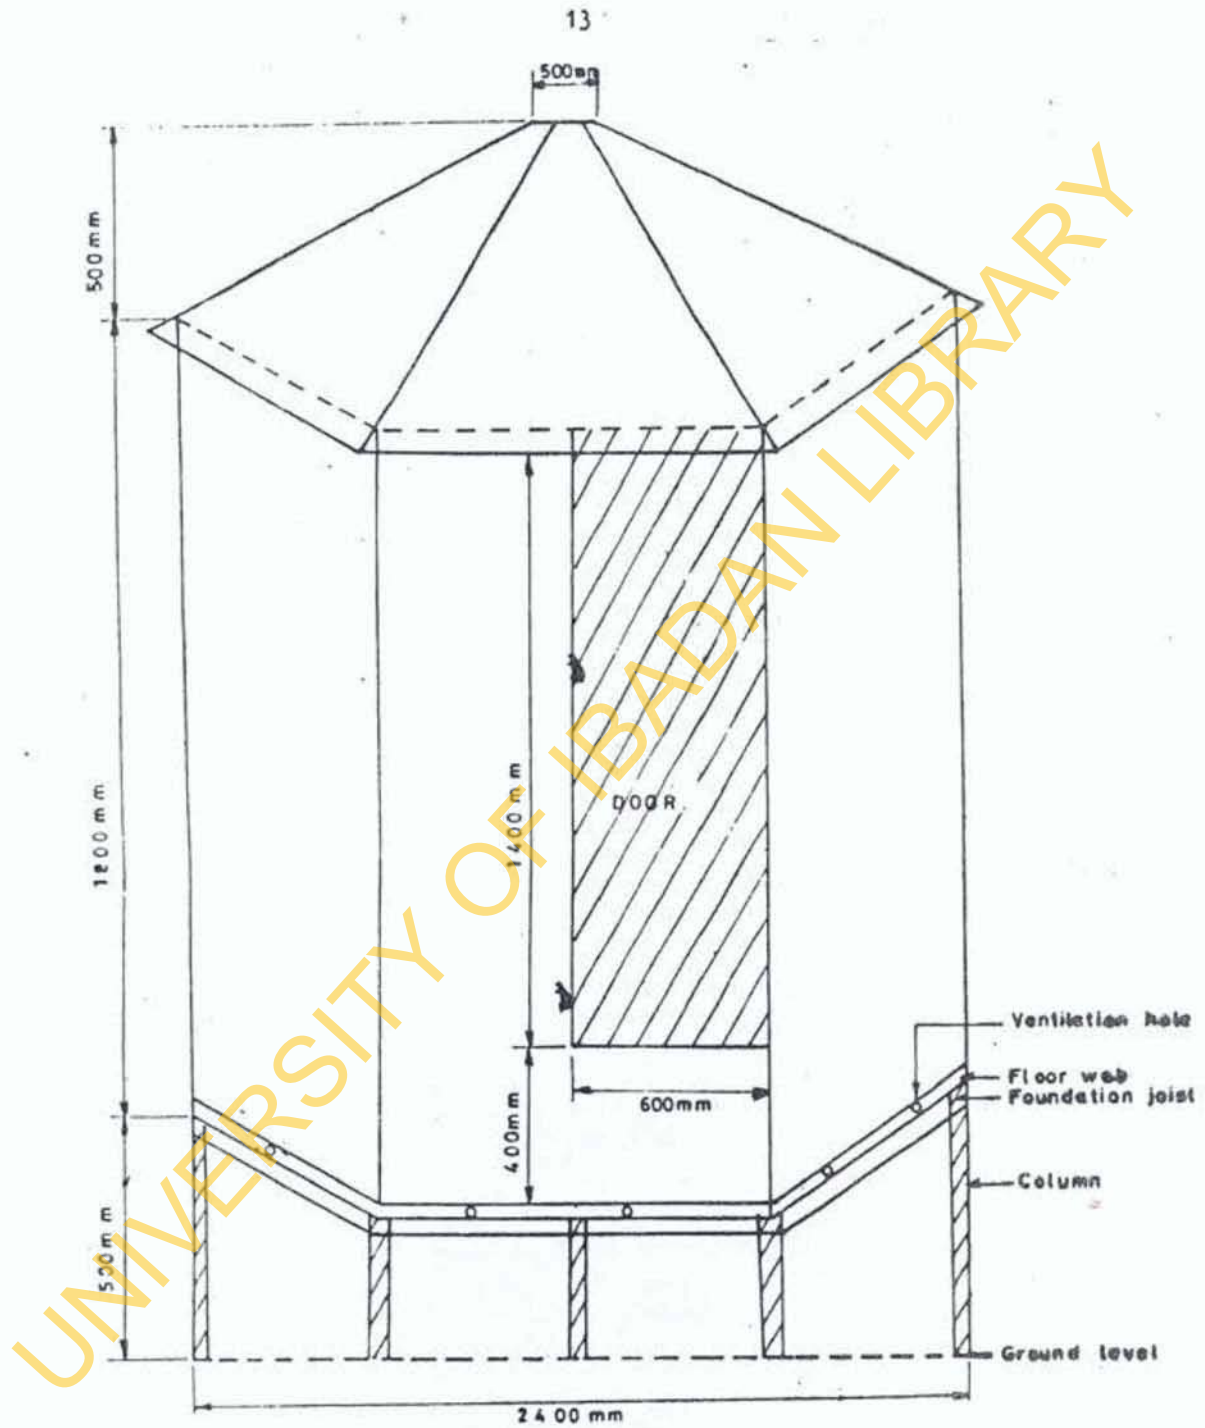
FRONT VIEW OF THE COMPLETE SILO ASSEMBLY
